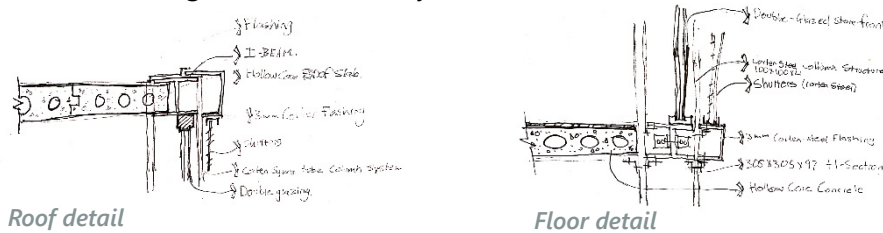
Sketch of hollowcore roof and floor within steel structure
